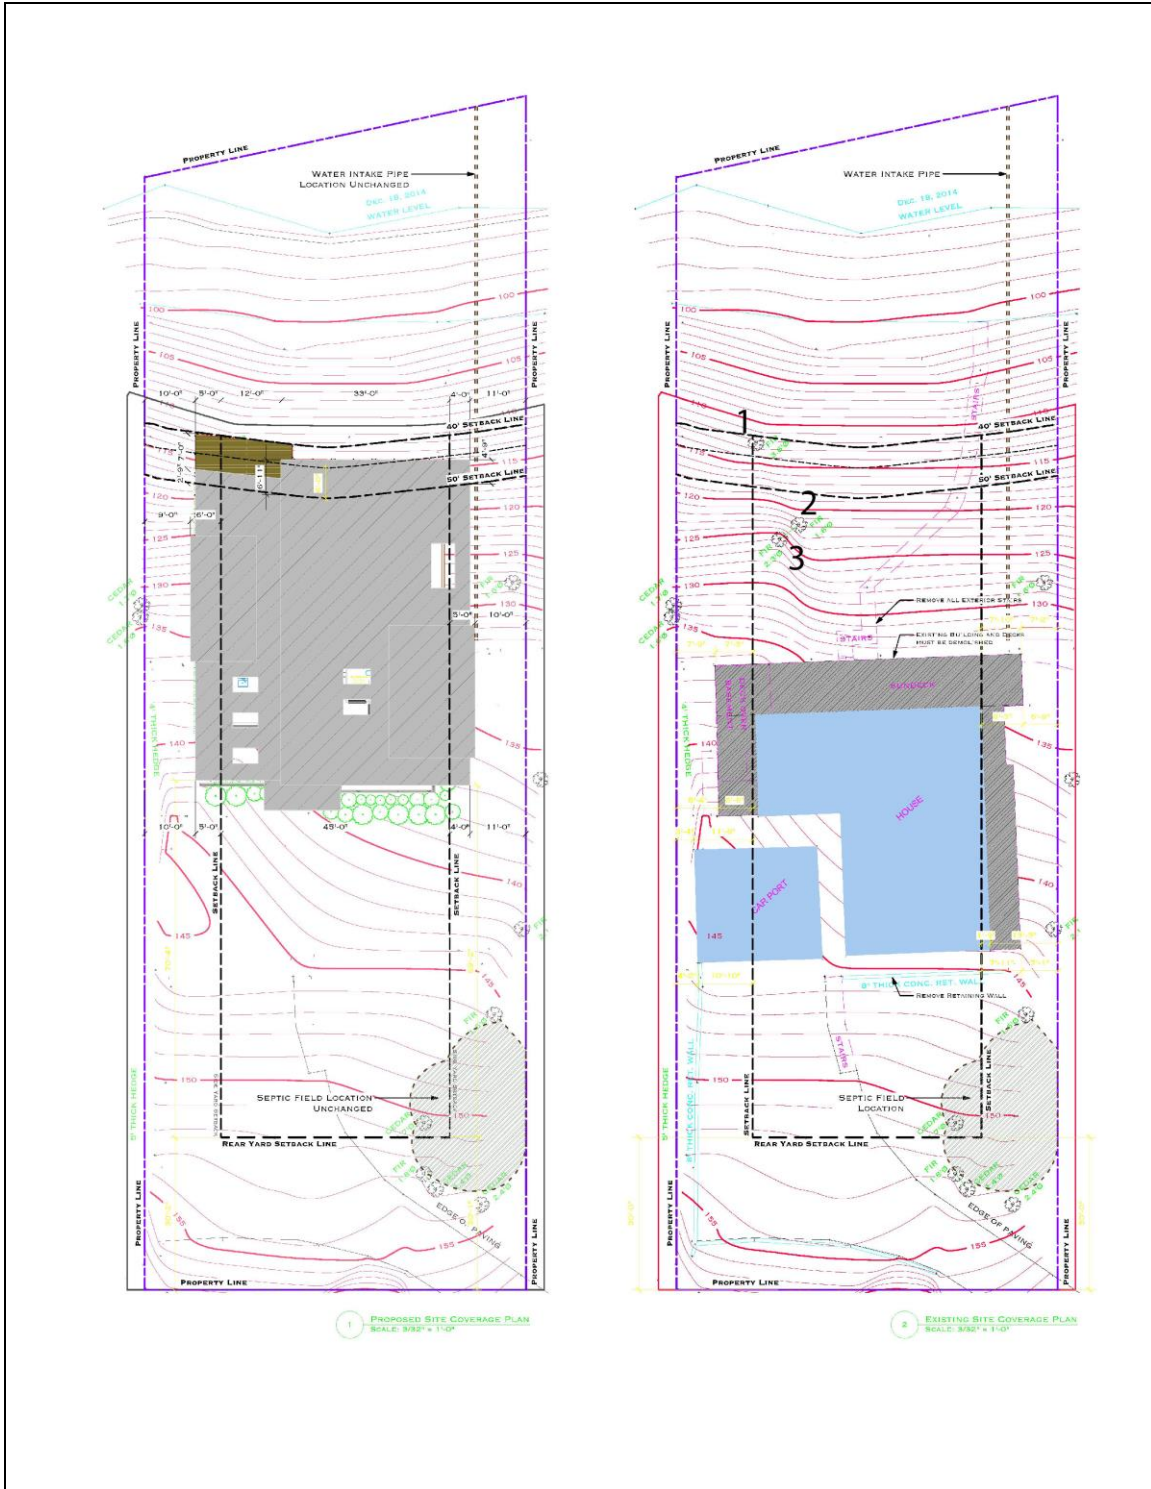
Proposed site coverage plan (left) and existing site coverage plan (right)
